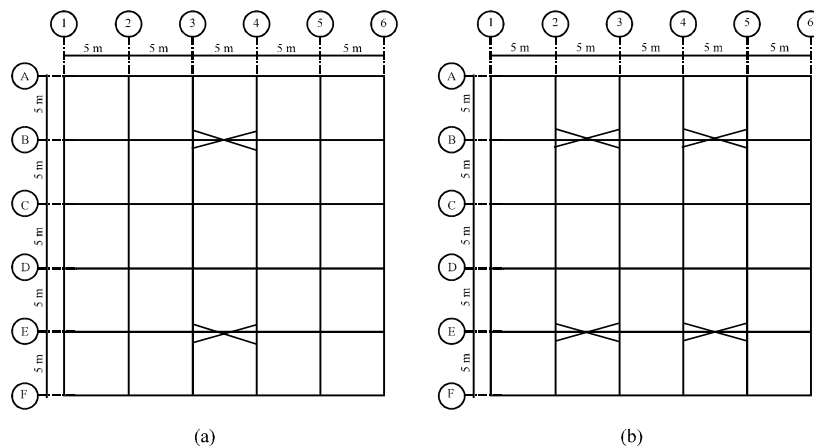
Retrofitting by cross bracing (a) two bays and (b) four bays
